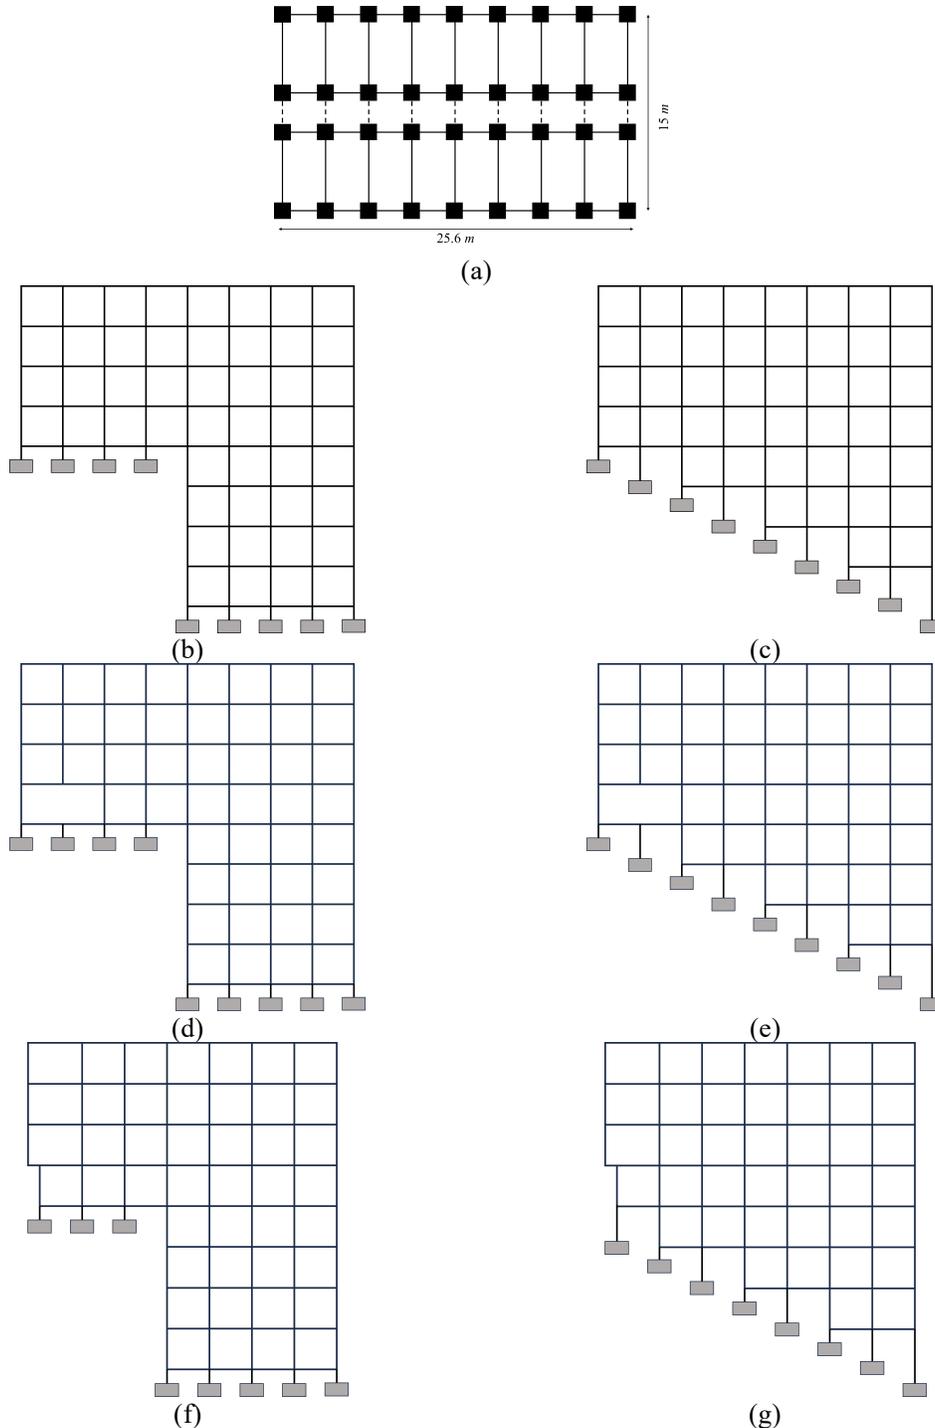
(a) Plan; and elevation of building with (b) split-foundation (SF); (c) step-back (SB) (d) split-foundation and intermediate floating columns (SF-FC); (e) split-foundation and overhanging floating columns (SF-OH); (f) step-back and intermediate floating columns (SB-FC); and (g) step-back and overhanging floating columns (SB-OH)
